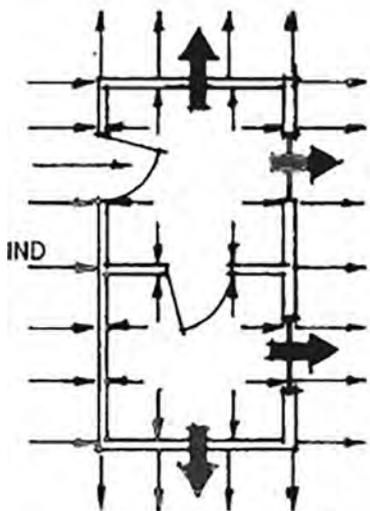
EXTERNAL PRESSURES ON WALLS OF A HOUSE
